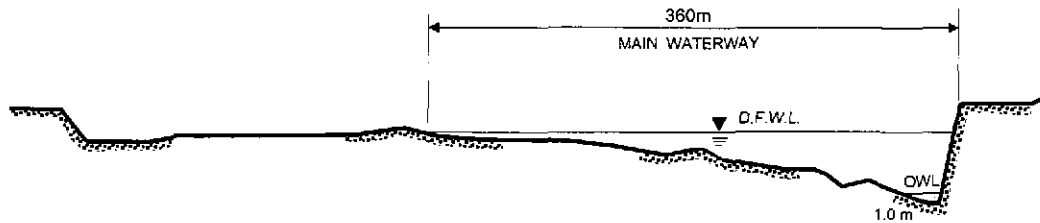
TALAVERA RIVER SECTION AT PROPOSED SITE LOCATION
